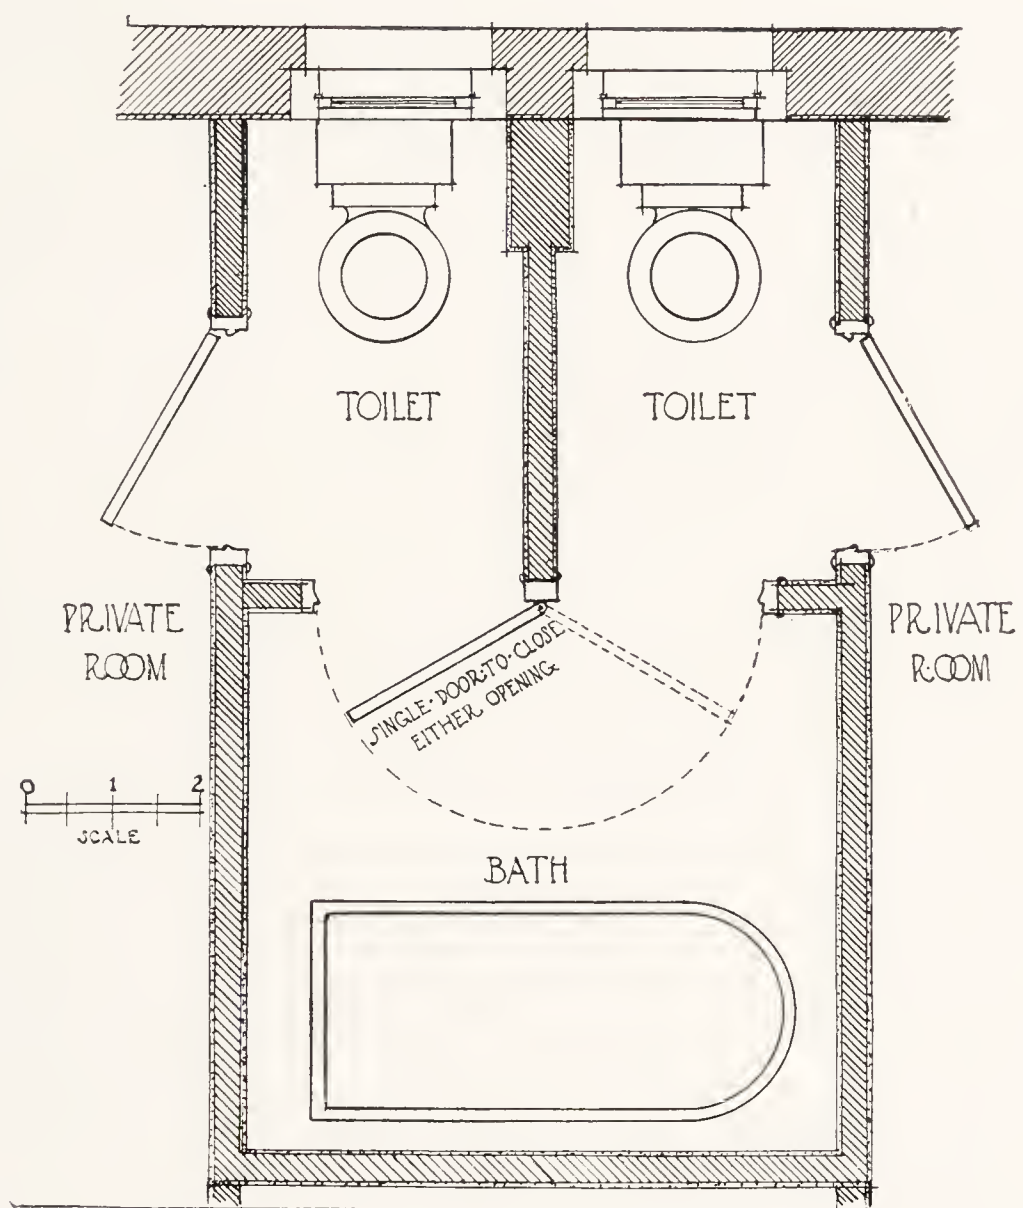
PIVOT DOOR SEPARATING BATH FROM TOILETS IN PRIVATE SUITE
